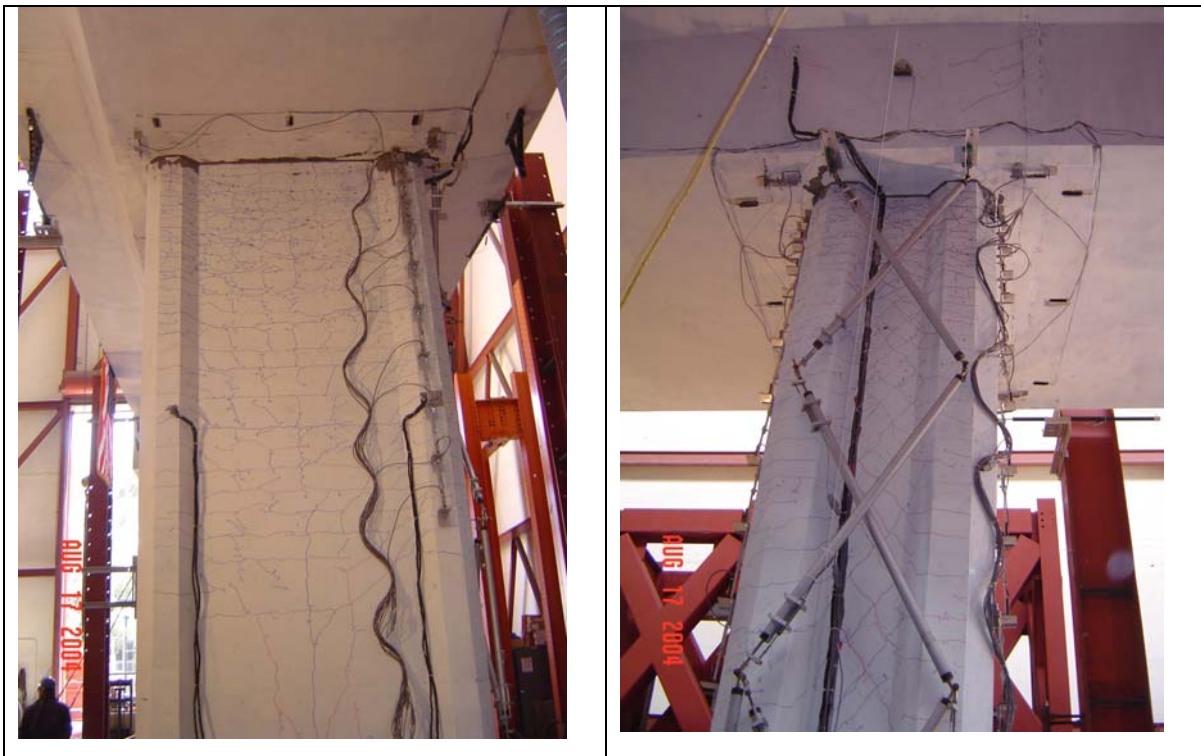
Marked crack pattern on north and west faces of column at $\mu=6$
